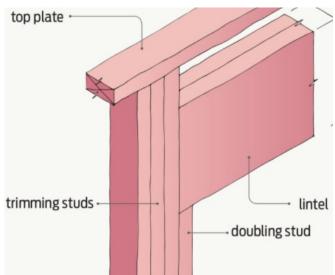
BRANZ drawing of trimming studs and doubling stud beside a rough opening.
